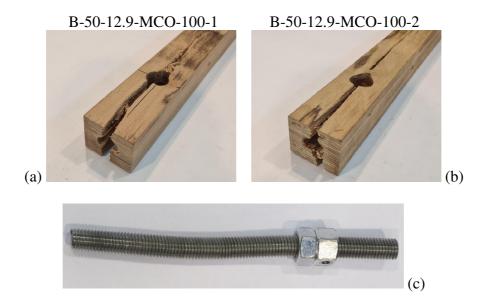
Non-preloaded specimens at the end of MTO tests: (a, b) splitting failure of the LVL member and (c) buckling of the threaded rod.
